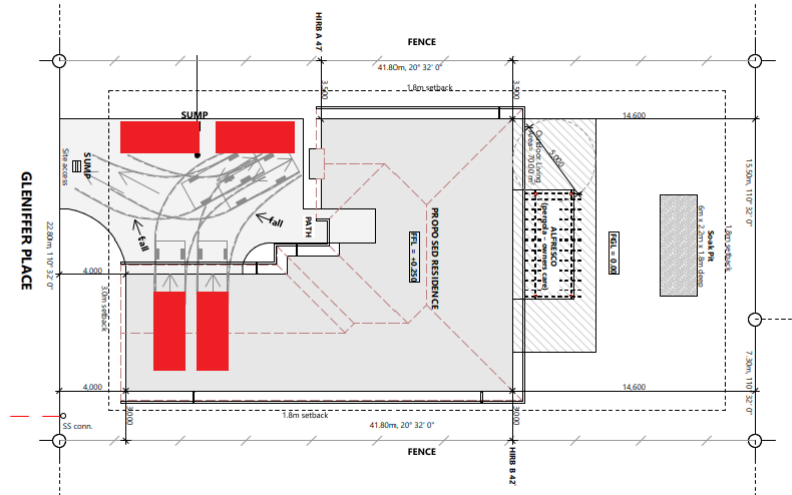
Site Plan showing proposed location of car parks (from page 9 of Visitor Accommodation Management Plan)
